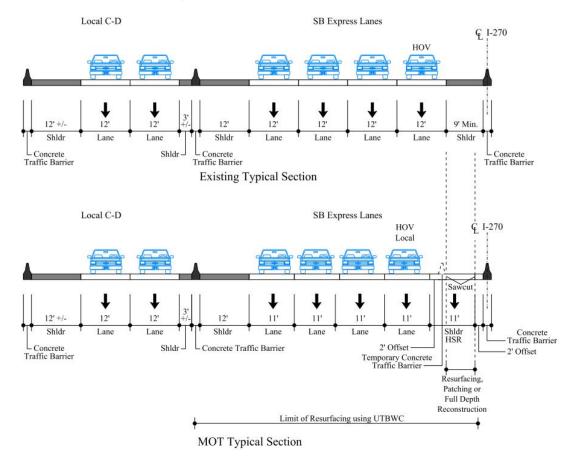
Existing and MOT Typical Sections SB IS-270 between Muddy Branch Road and Montrose Road
